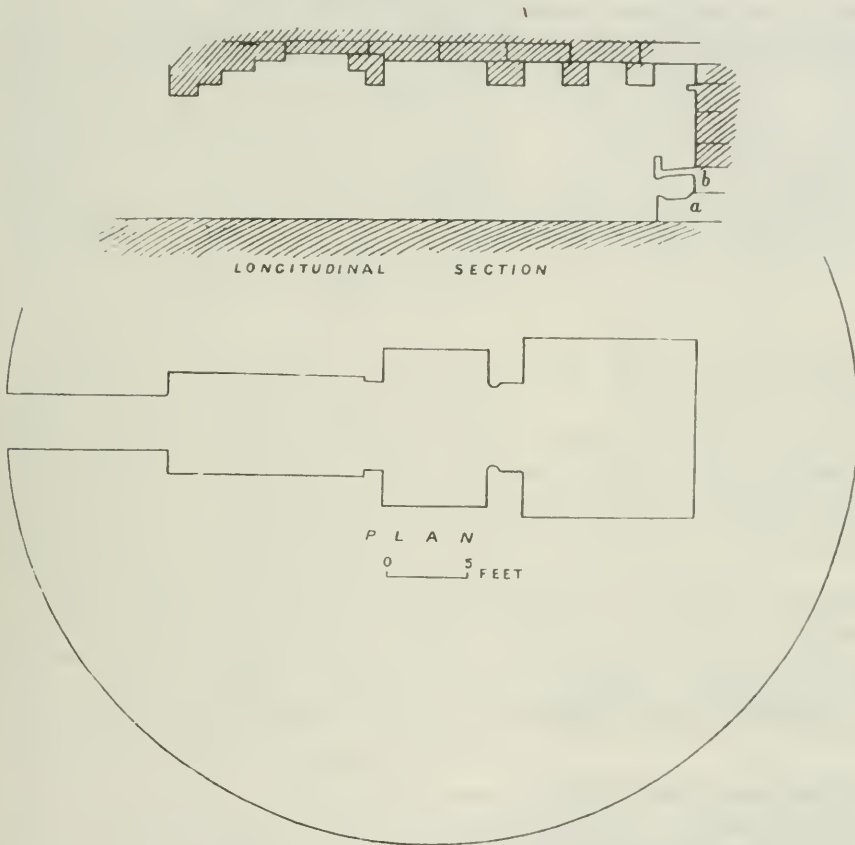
PLAN AND SECTION OF ALTYN-TASH TUMULUS.
